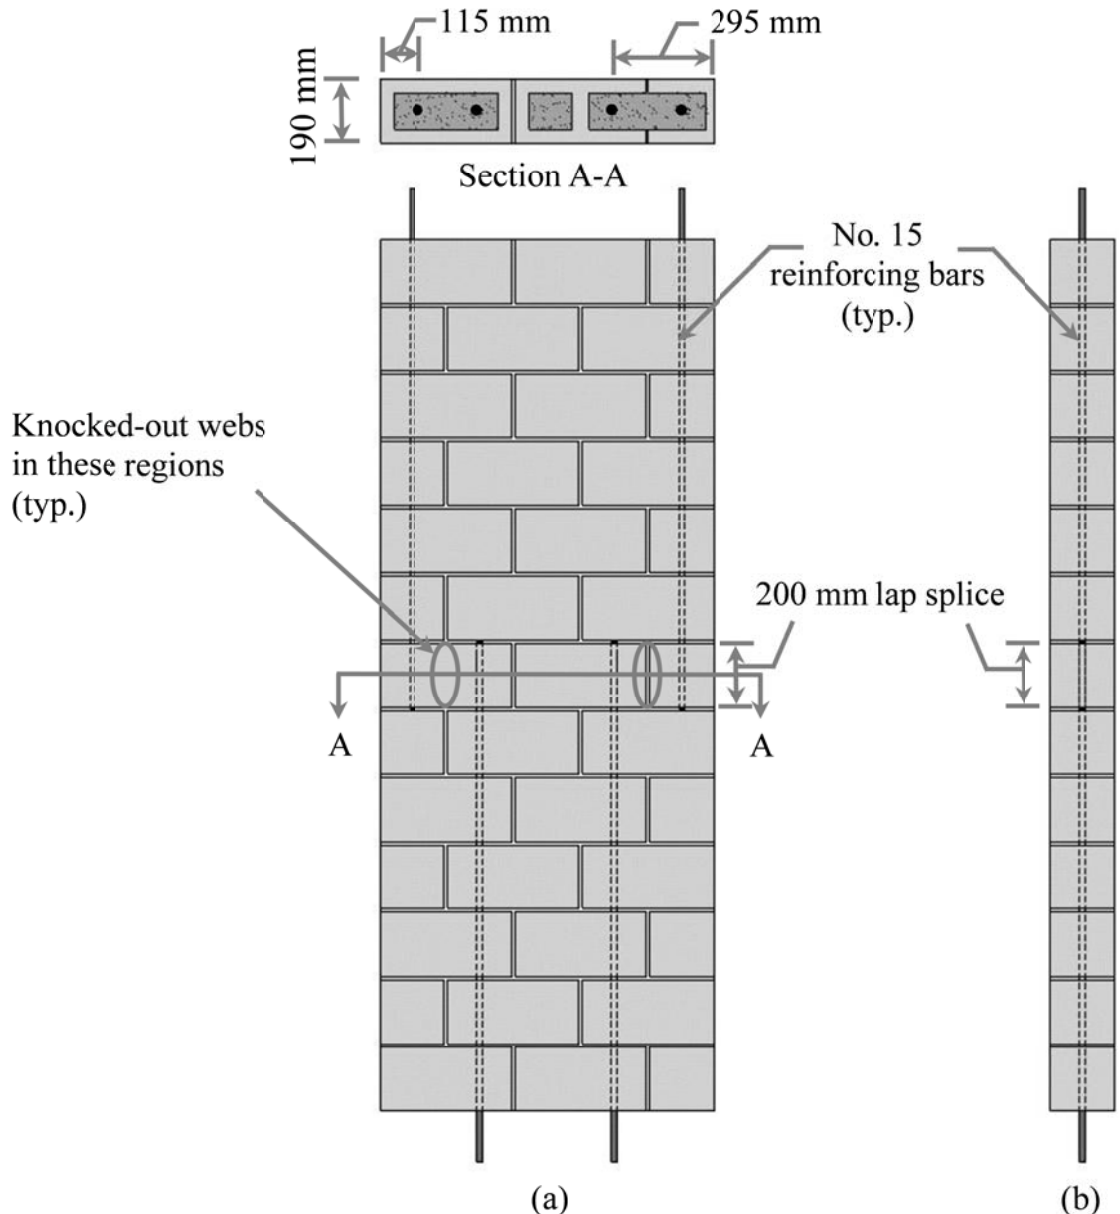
Remediated Wall Splice Specimen Featuring a Single Course of Knock-Out Webs (IKO): (a) Elevation Including a Section at Splice Level, and (b) Side Profile.
